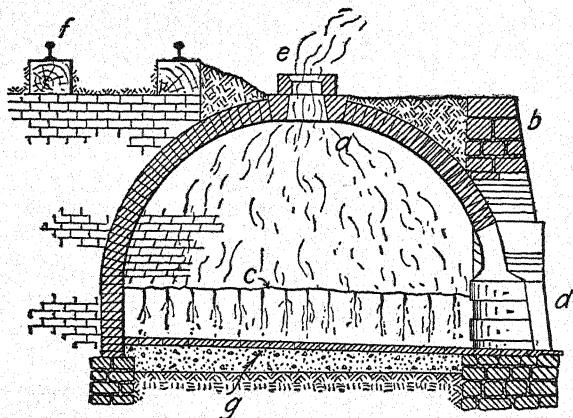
Beehive coke oven. *a.* Arched roof. *b.* Retaining wall. *c.* Charge. *d.* Drawing door. *e.* Trunnel head, or eye. *f.* Tracks. *g.* Slanting floor. (Courtesy of Bureau of Mines.)
